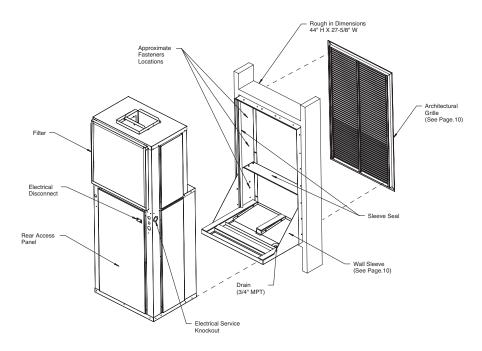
A - General Assembly for Large sleeve and Grill size 24
